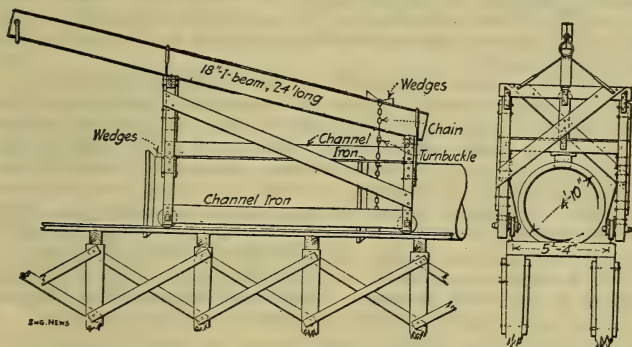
Details of a specially designed travelling crane for placing 48-in. gas main on a narrow pile trestle over a swamp.
